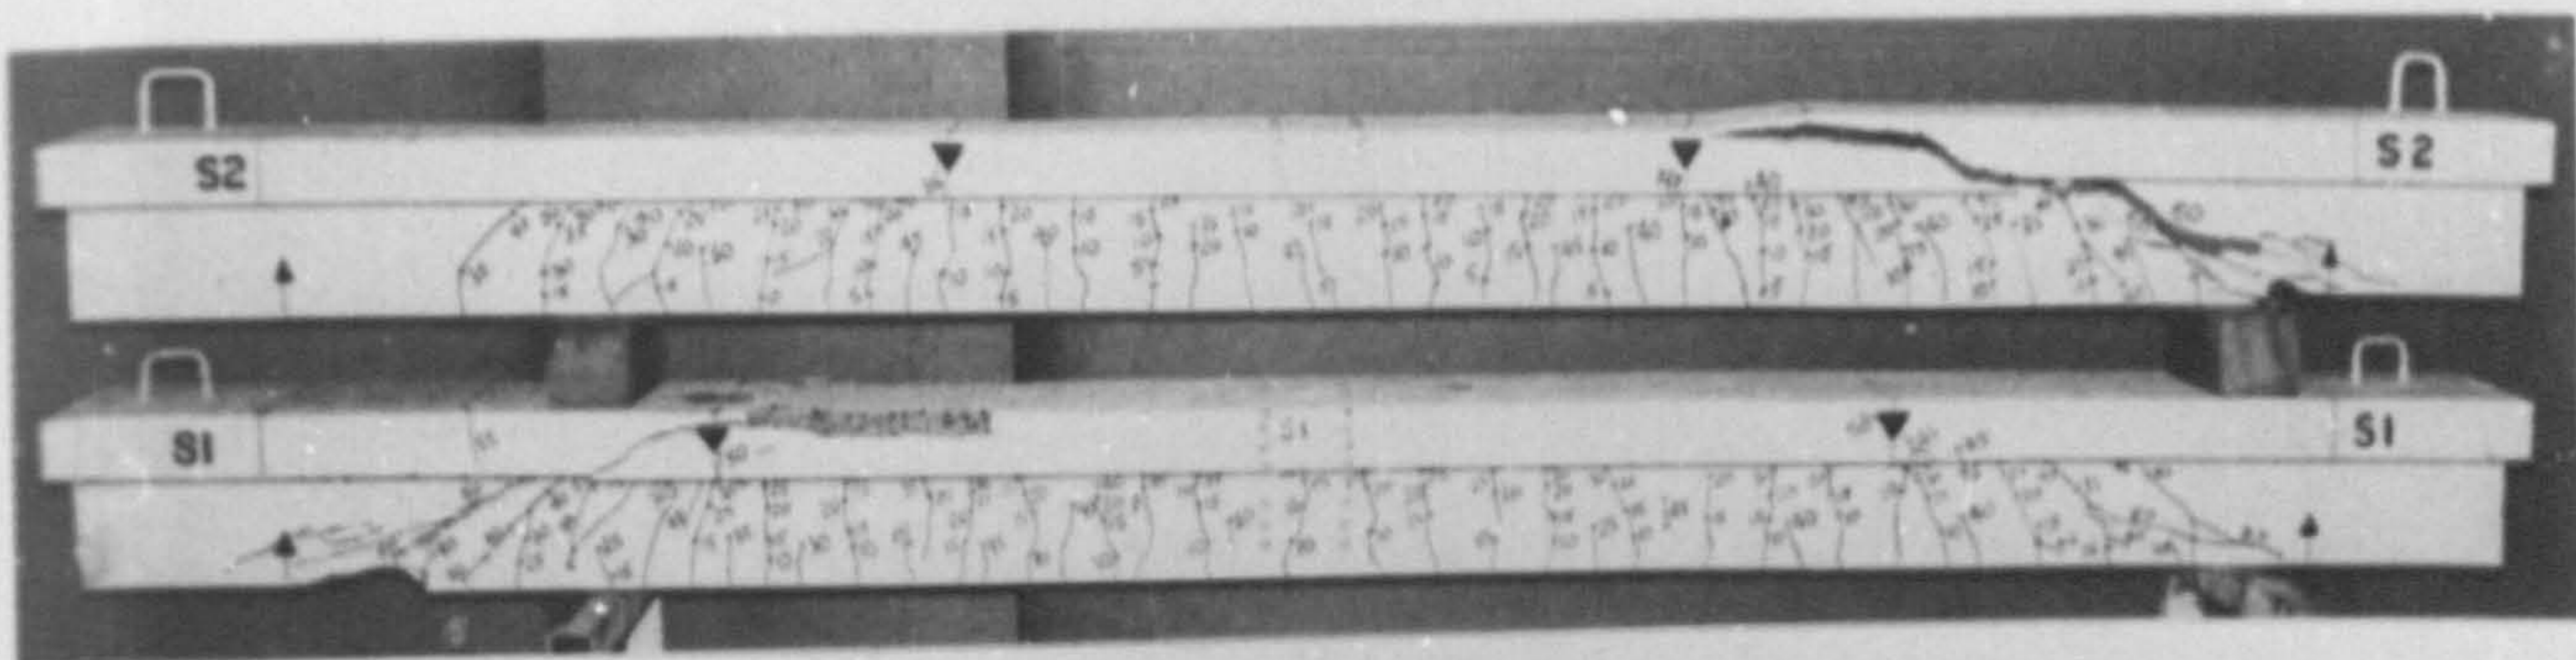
(c) FAILURE MODES FOR LYTAG-SAND CONCRETE T-BEAMS IN SHEAR
